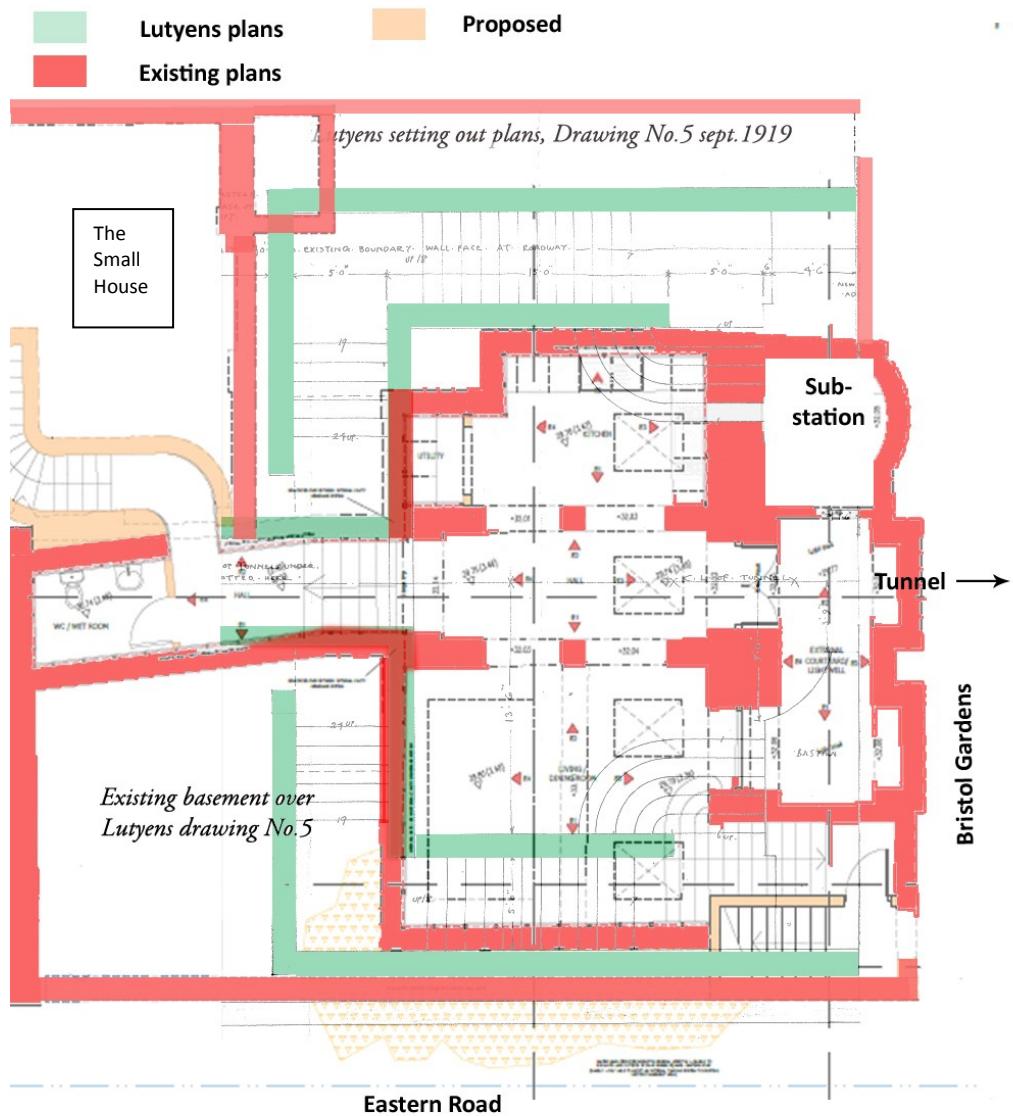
Lutyens' sketch of the basement and garden plan superimposed over the basement plans.
